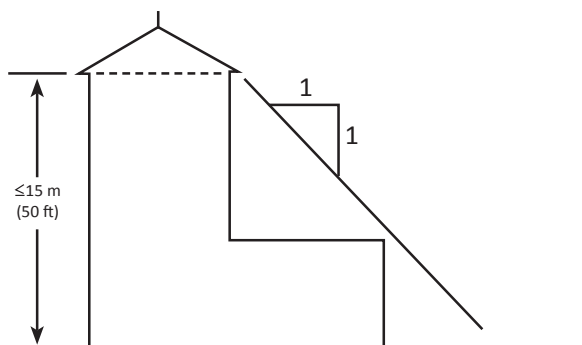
(b) Lower Roof Protection Provided by Pitched-Roof Buildings 15 m (50 ft) or Less in Height.
